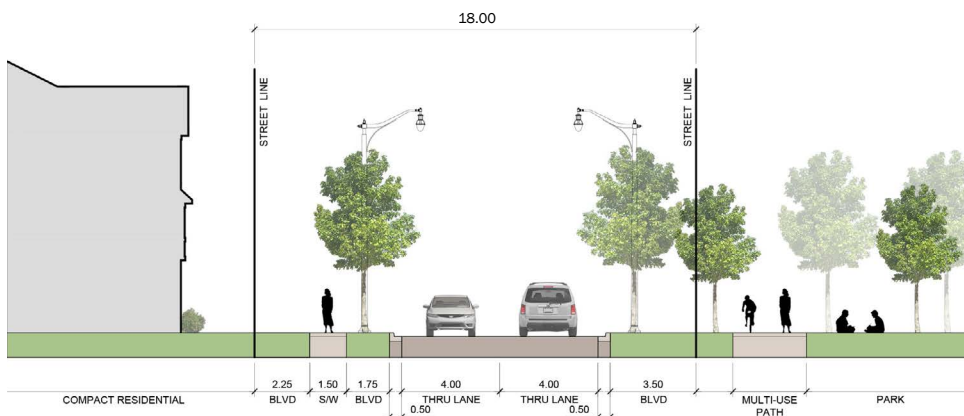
Single Loaded 18.0m Local Road Cross Section through Compact Residential Area.
